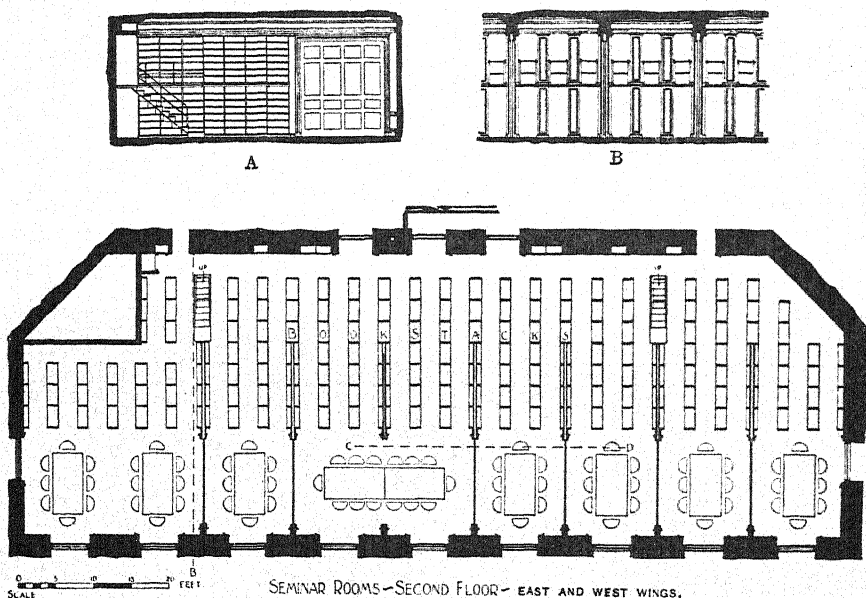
Columbia University. Plan of seminar rooms shown in figure 19. A, section through A B; B, section through C D.
